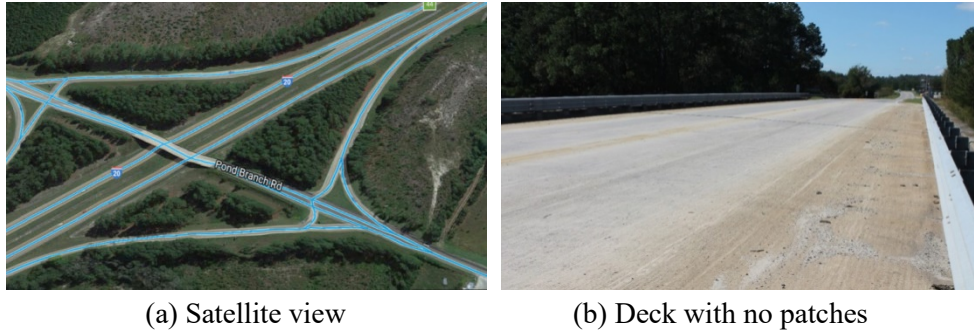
S-34, Pond Branch Road over I-20 (good condition)
